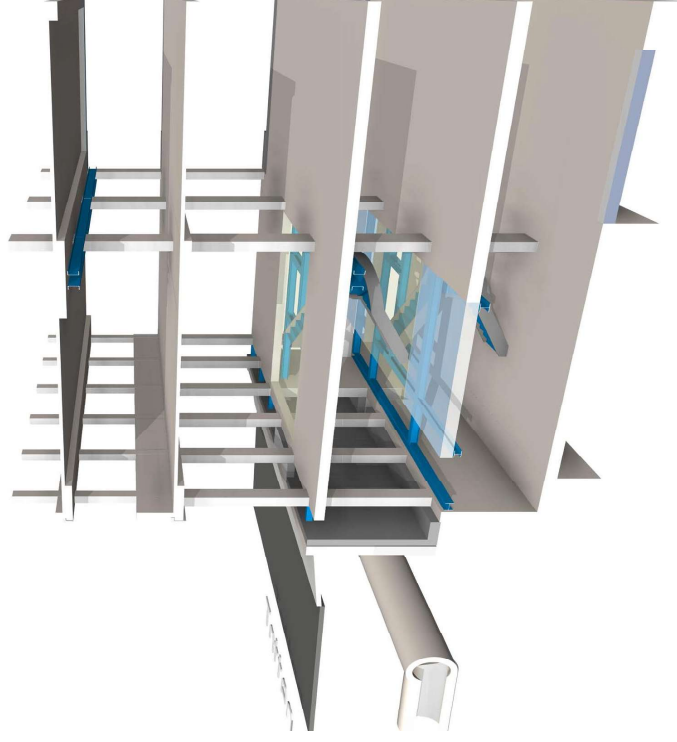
Existing, Demolition and Proposed Details of Lightwell Modification
